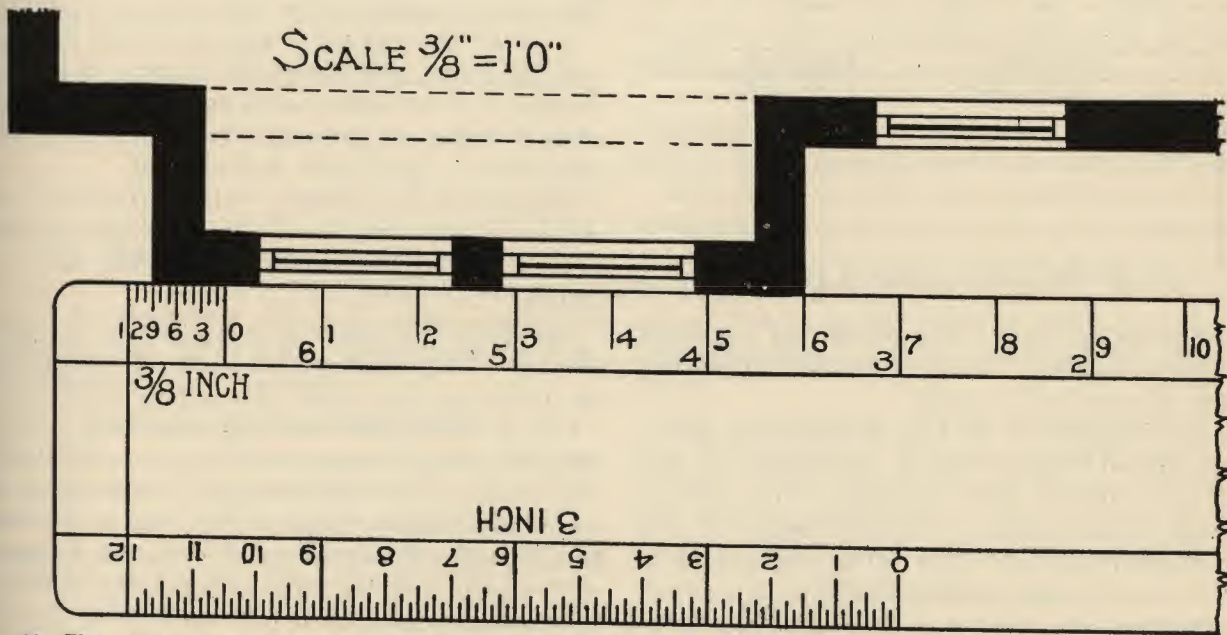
The method of using a scale to find a dimension on a plan. It shows the outside dimension of bay window is 6 feet 9 inches.
